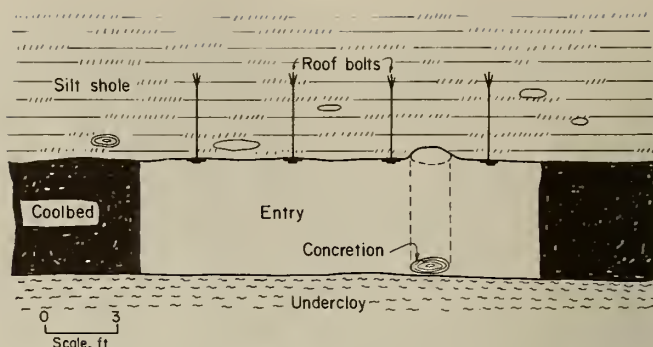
Subtype G_4 roof failure attributed to concretions.
